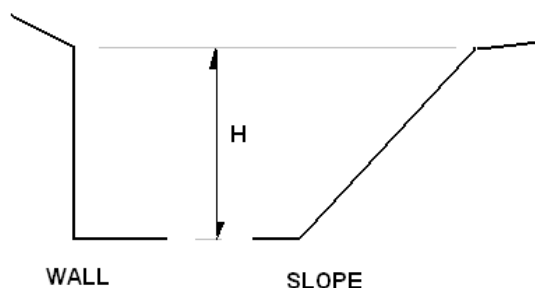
Exposed height (H) for a retaining wall or slope.
